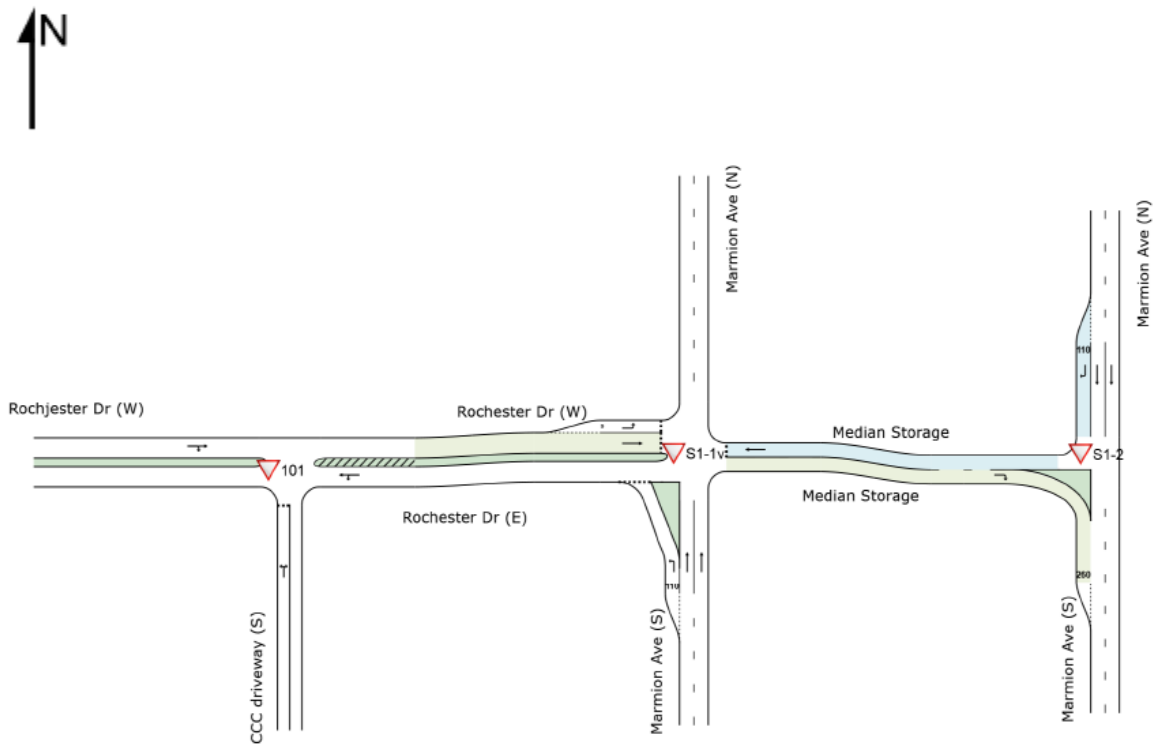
Marmion Ave / Rochester Dr intersection and proposed CCC driveway layout analysed in SIDRA Network
